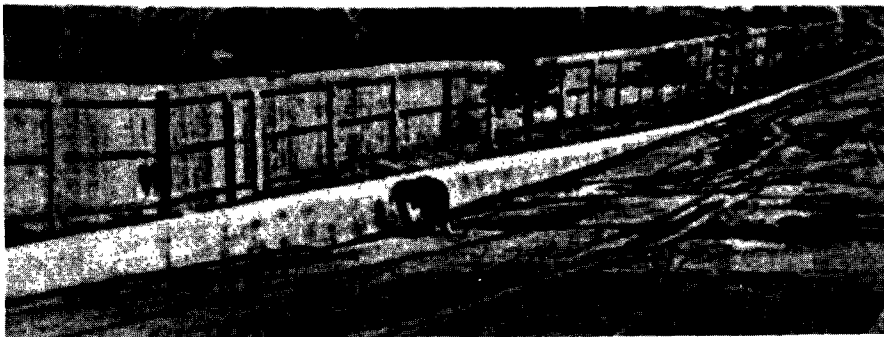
Storm Water Detention Storage Structure in Lower Portion of Parking Lot (Reference No. 14).
